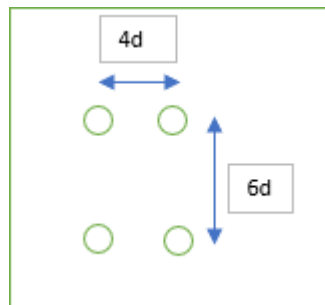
Spacing of Shear Studs as suggested by *Structural Steel Design
